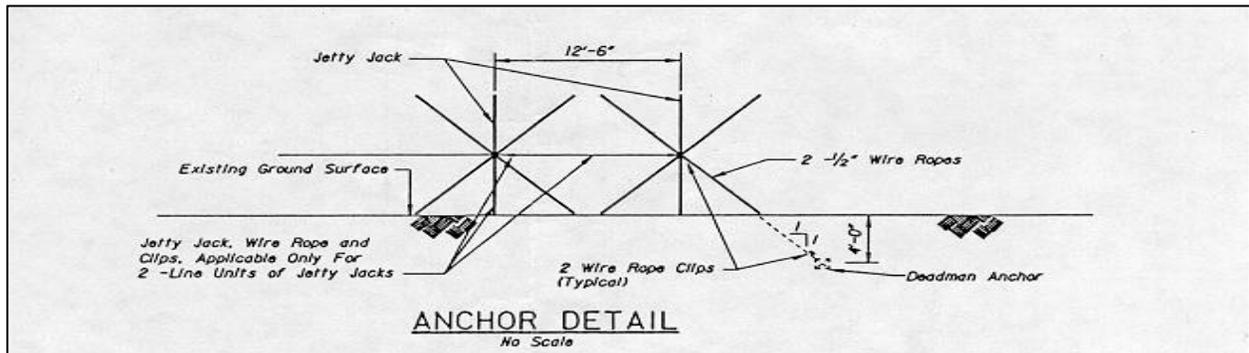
Detail of typical jetty jack and deadman anchoring
